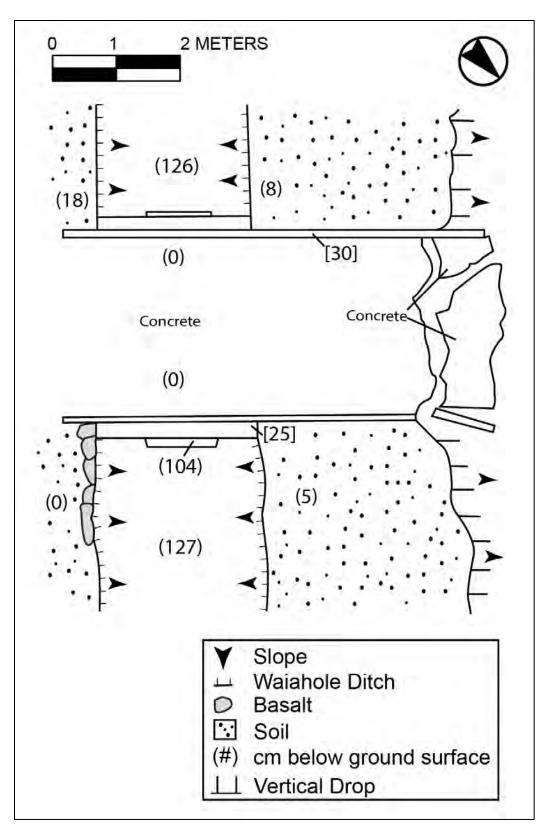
SIHP # 50-80-09-2268 Feature E culvert and ditch plan map
